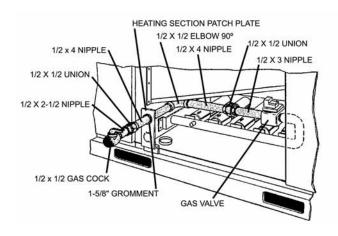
EXTERNAL SUPPLY CONNECTION EXTERNAL SHUT-OFF
